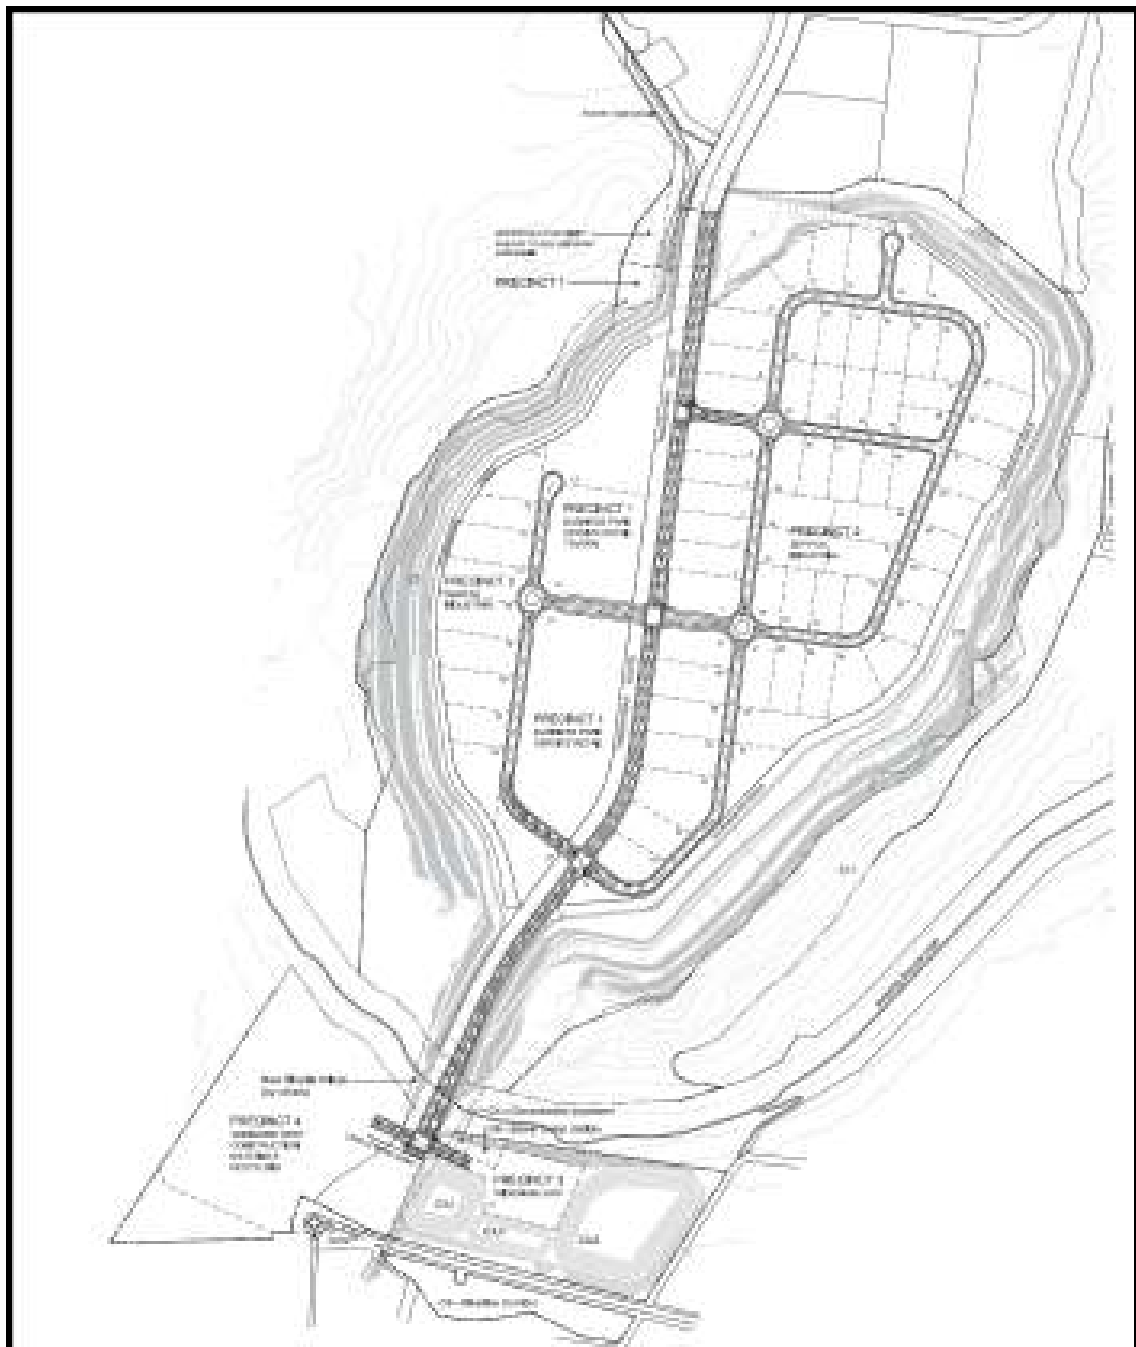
Greystanes Southern Employment Lands – Project Application Subdivision (as exhibited)
